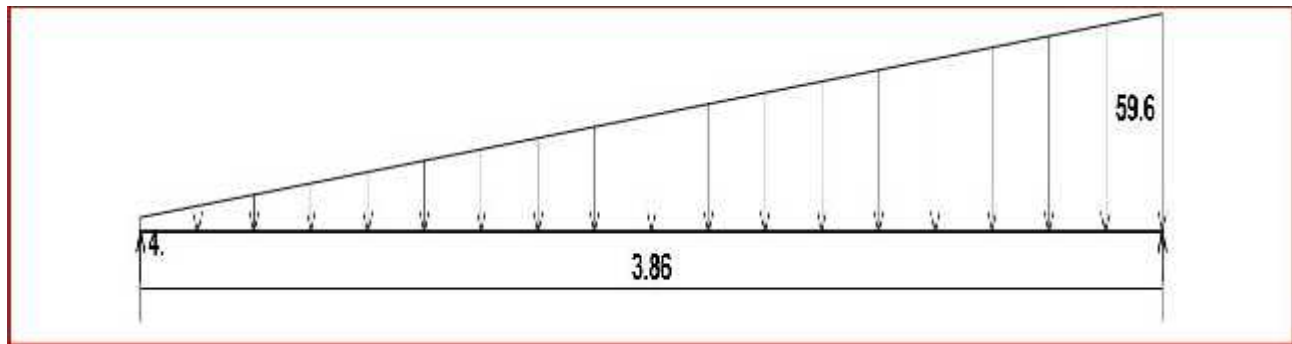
Loads & Shear/Moment envelope for basement wall
